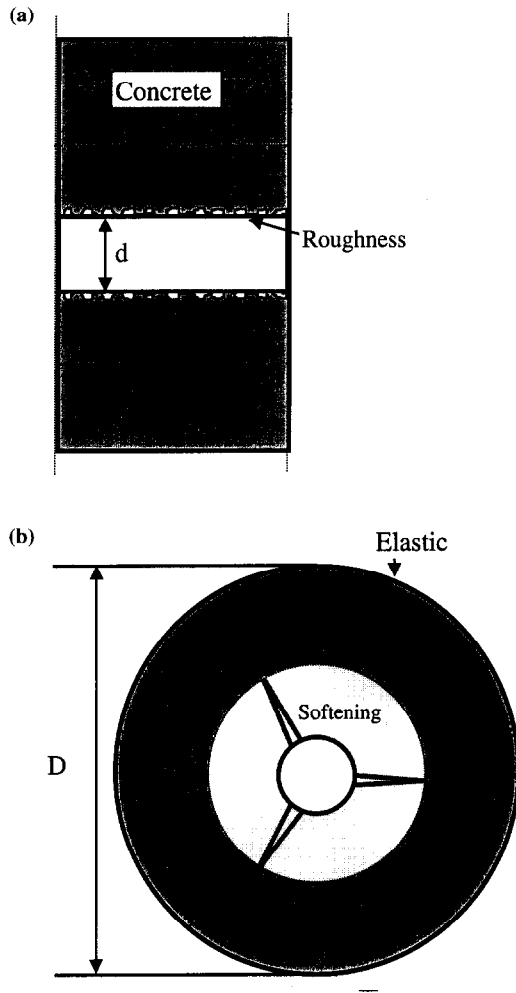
Splitting failure of bond of FRP rod and surrounding concrete: (a) longitudinal section with roughness; and (b) cross section indicating material state.
